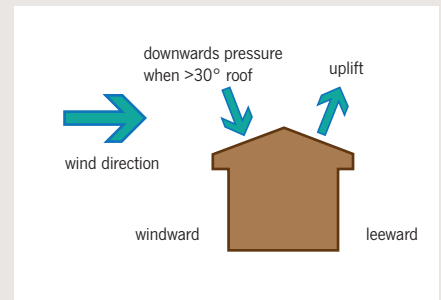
Simplified wind forces on greater than 30° roof pitch.
